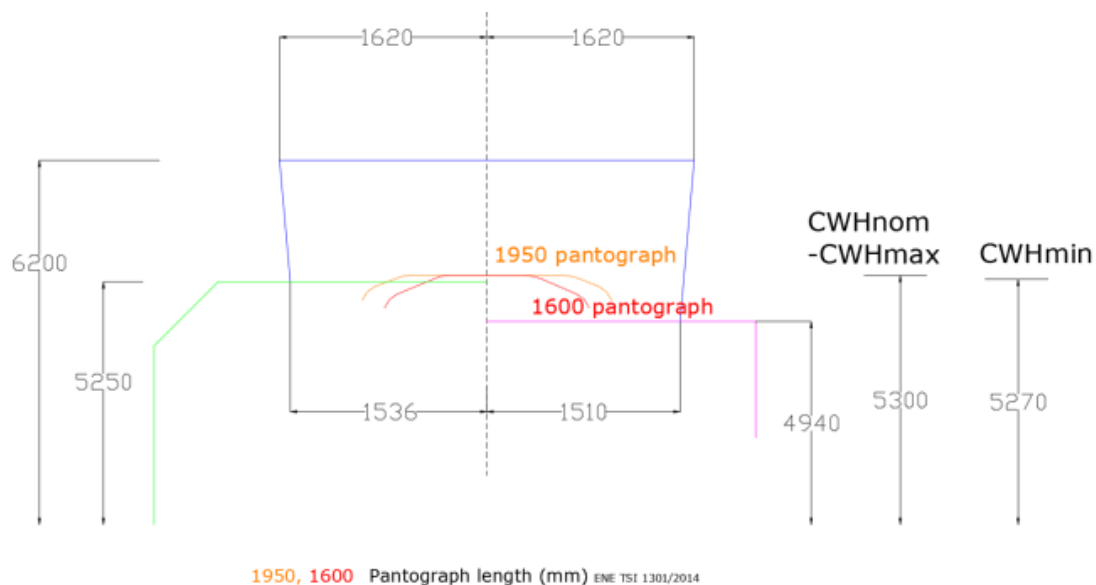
Gauntlet track structure gauge for 1520 and 1435 mixed traffic sections (dimensions in mm)
